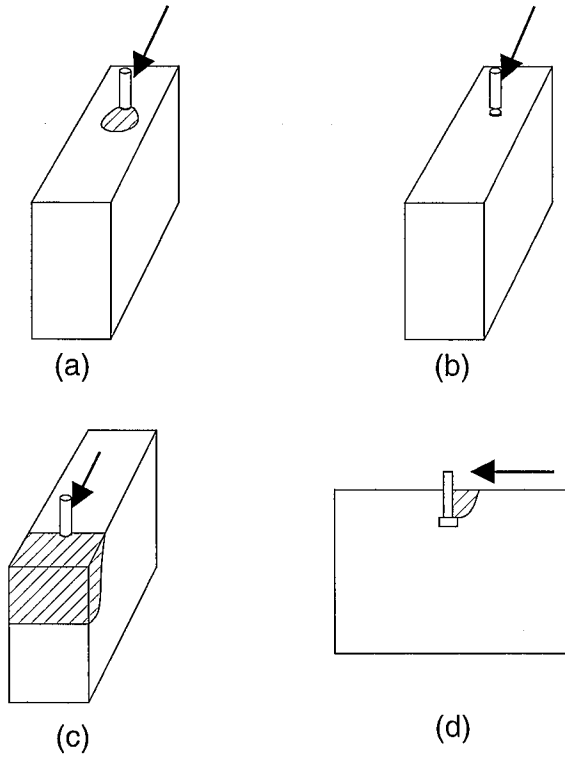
Failure Modes of a Headed Stud Connector Loaded in Shear
